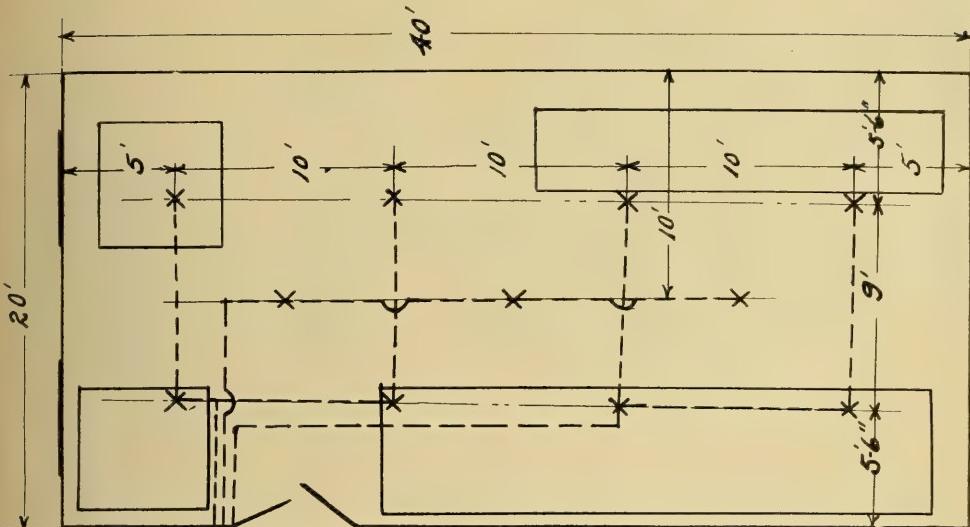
ILLUMINATING PLAN. (X) 132 WATT NERNST SINGLE GLOWER UNITS.
